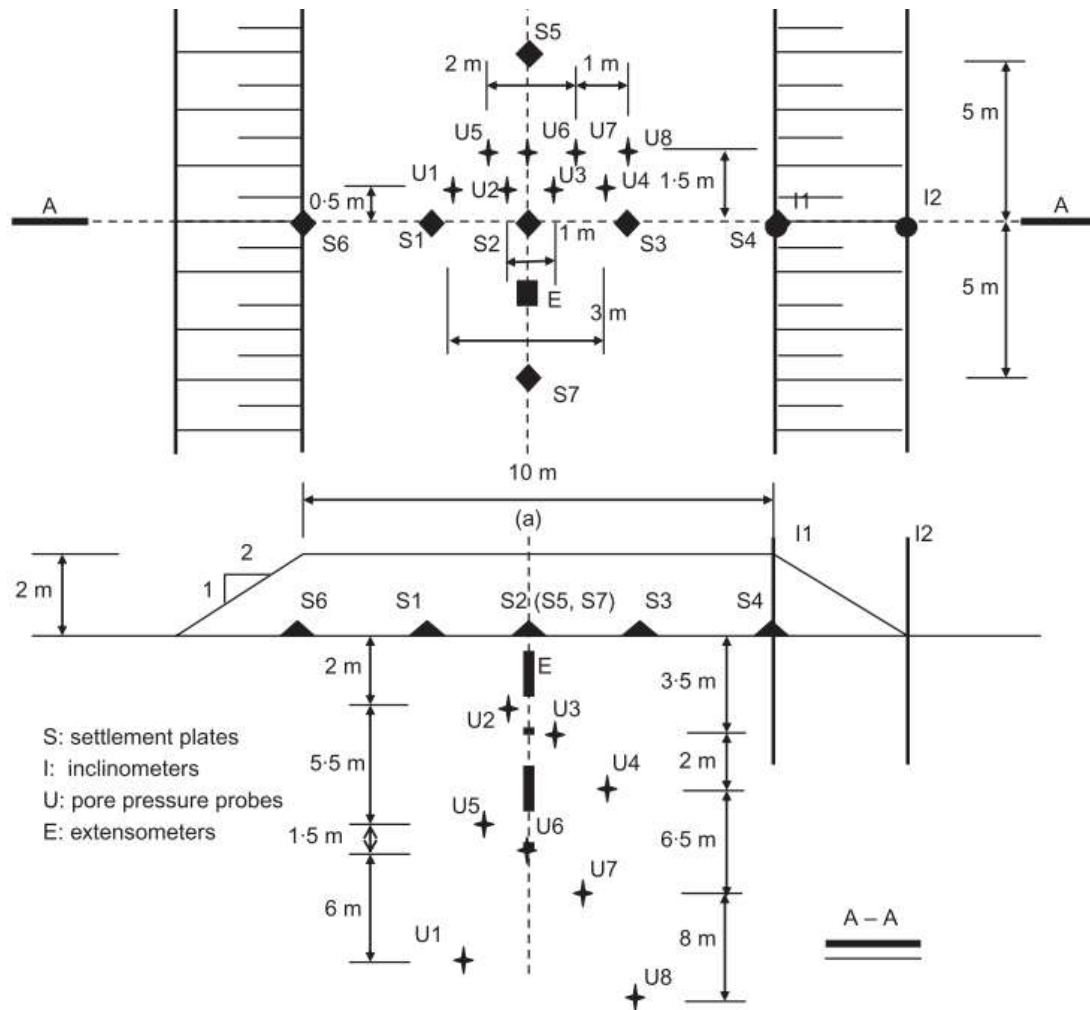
Murro Test Embankment Layout, from Karstunen et al. (2010)
